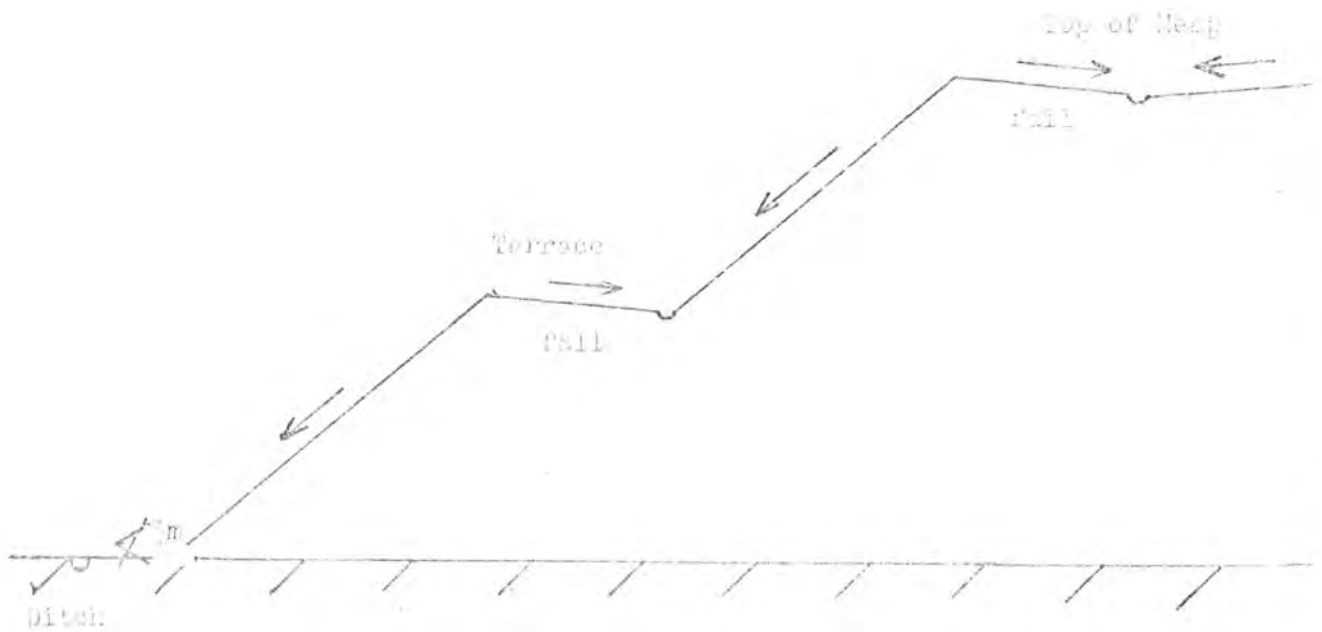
Construction of a stepped lagoon bank (after [reference]).
